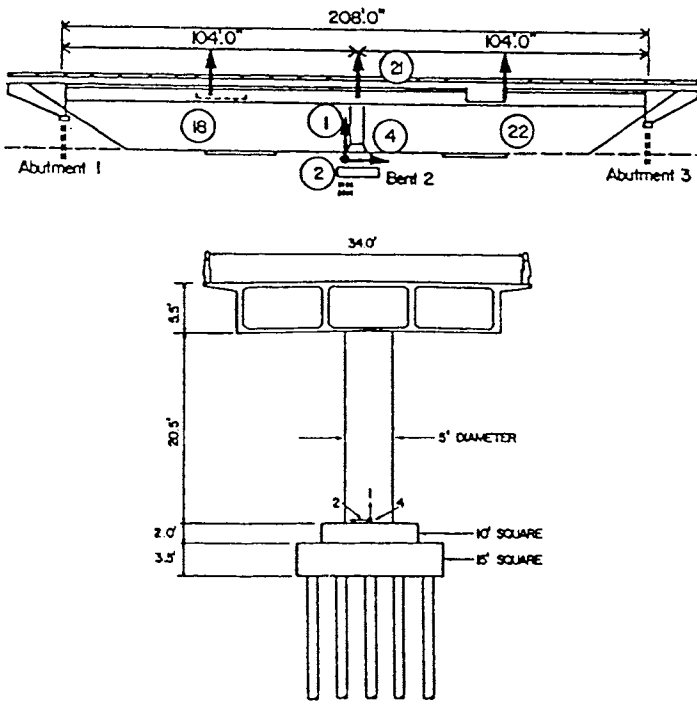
Elevation and Section of the Meloland Road Overpass (Rojahn et al., 1982)
